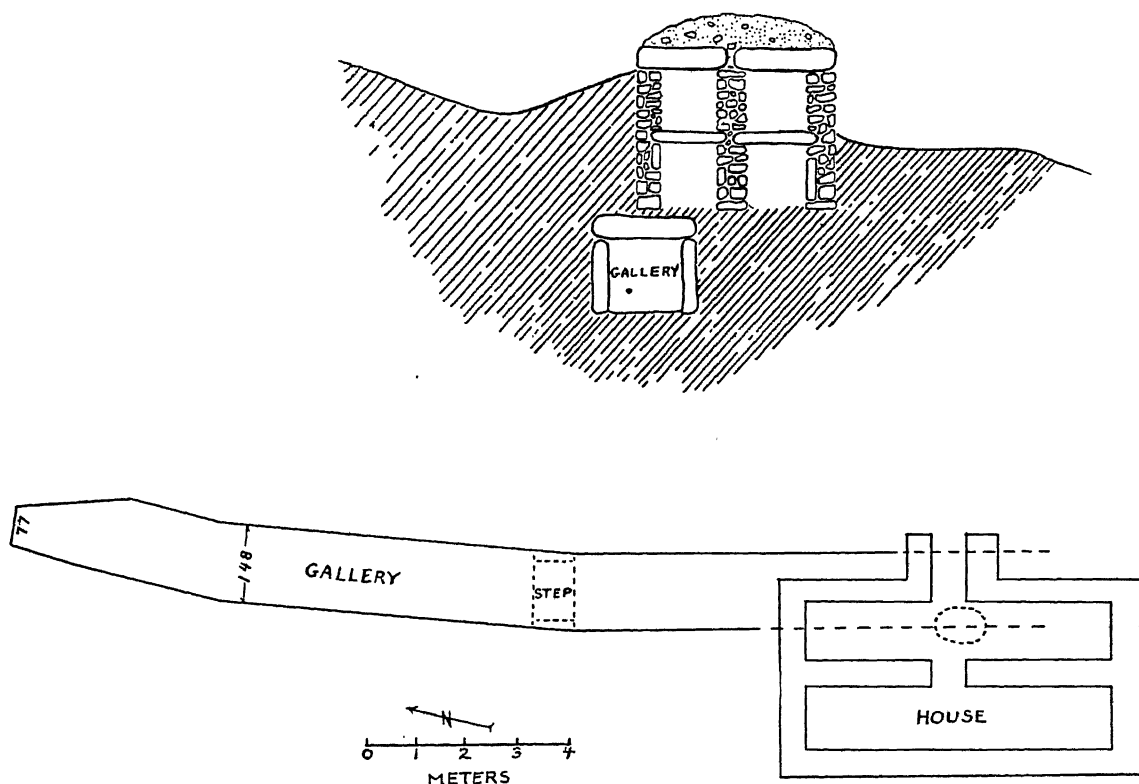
Groundplan and cross-section of house-gallery stratification, Wilkawain.
